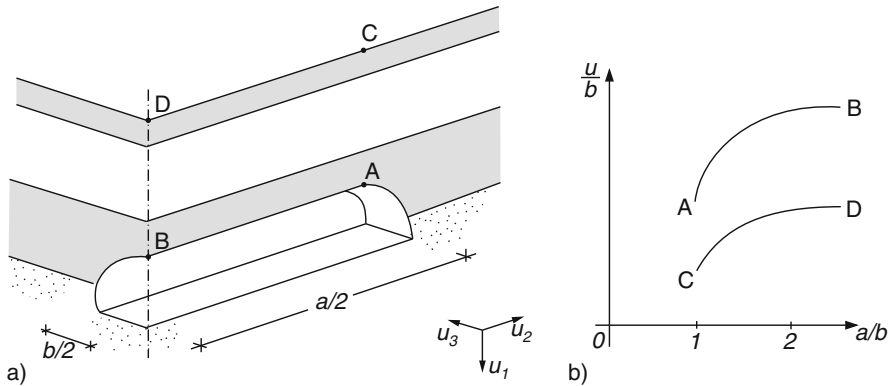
Excavation of a tunnel without support (a), interpolation as Fig. 15.1.1b (b)
